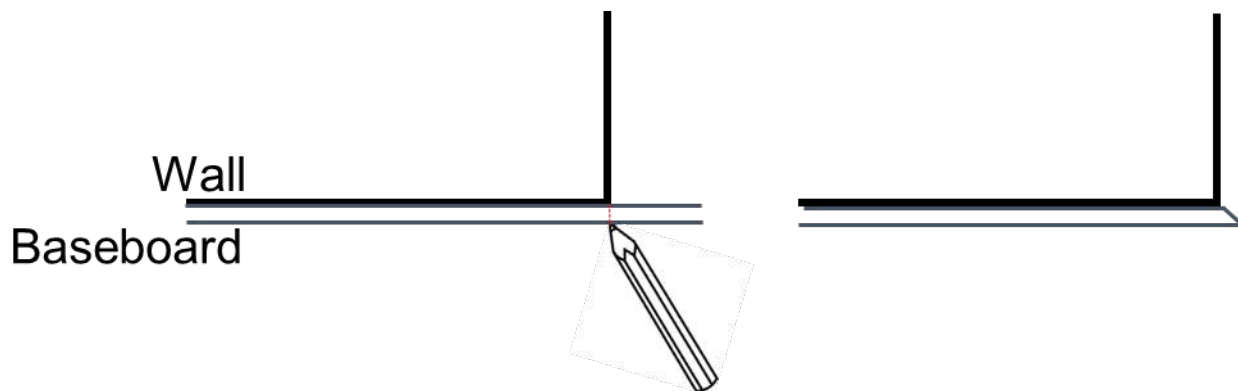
Marking and Cutting Baseboard for Outside Corners
